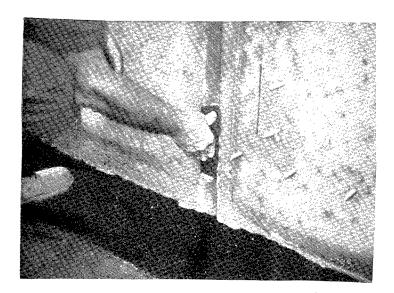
Installation of neoprene rubber cut to fit construction joint to allow continuous seal of repair system to concrete
